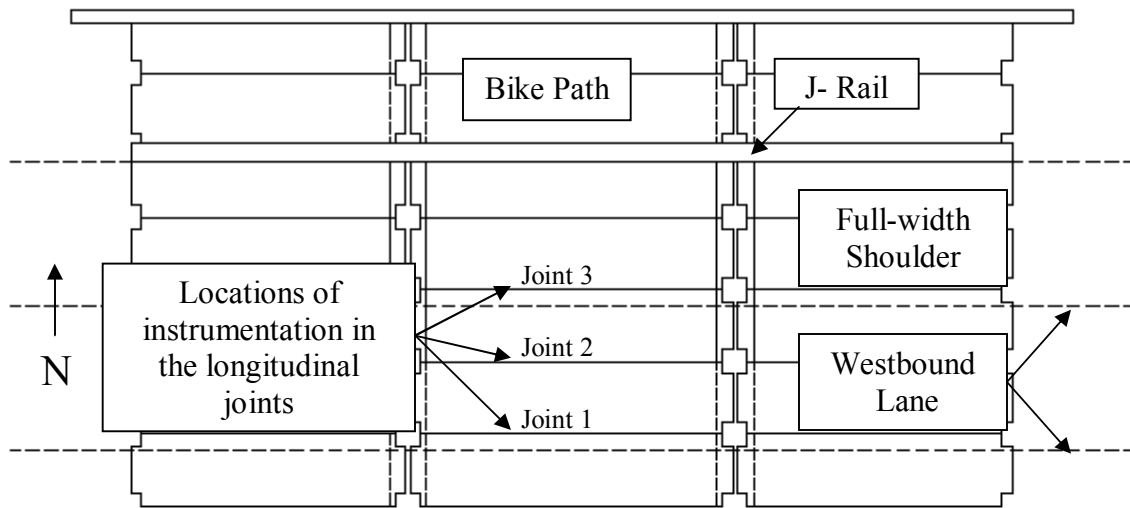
Plan view of Stage 1 of the bridge construction for Mn/DOT Bridge No. 13004 highlighting the instrumented joints
